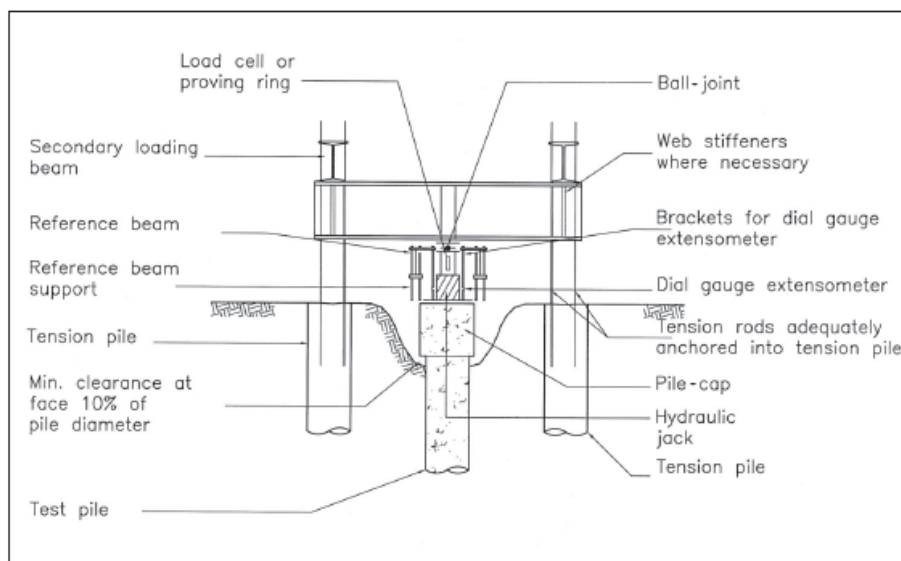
Typical Compression Test Arrangement (after Byrne, G. & Berry, A.D. (2008) pp 158)
